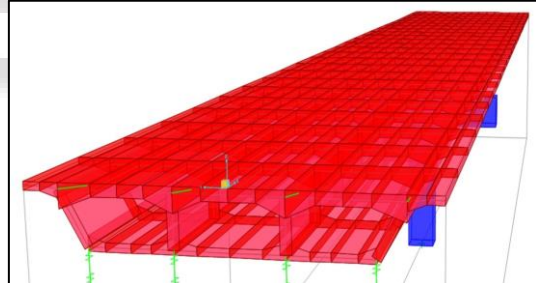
Multi Cell Box Girder of Exterior Girders Slopped
